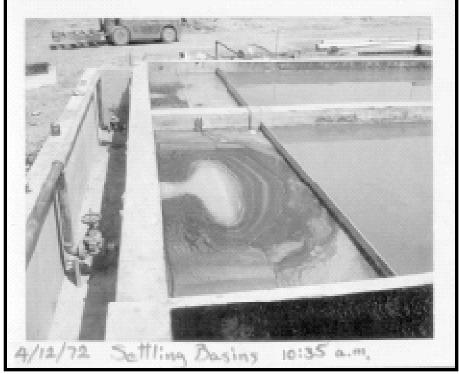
April 12, 1972 photo. View looking north at west side of new settling basins.
